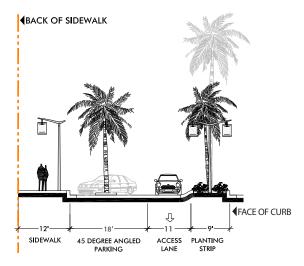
5)b)Neighborhood Center Streetfront with Access Lane Public Frontage
